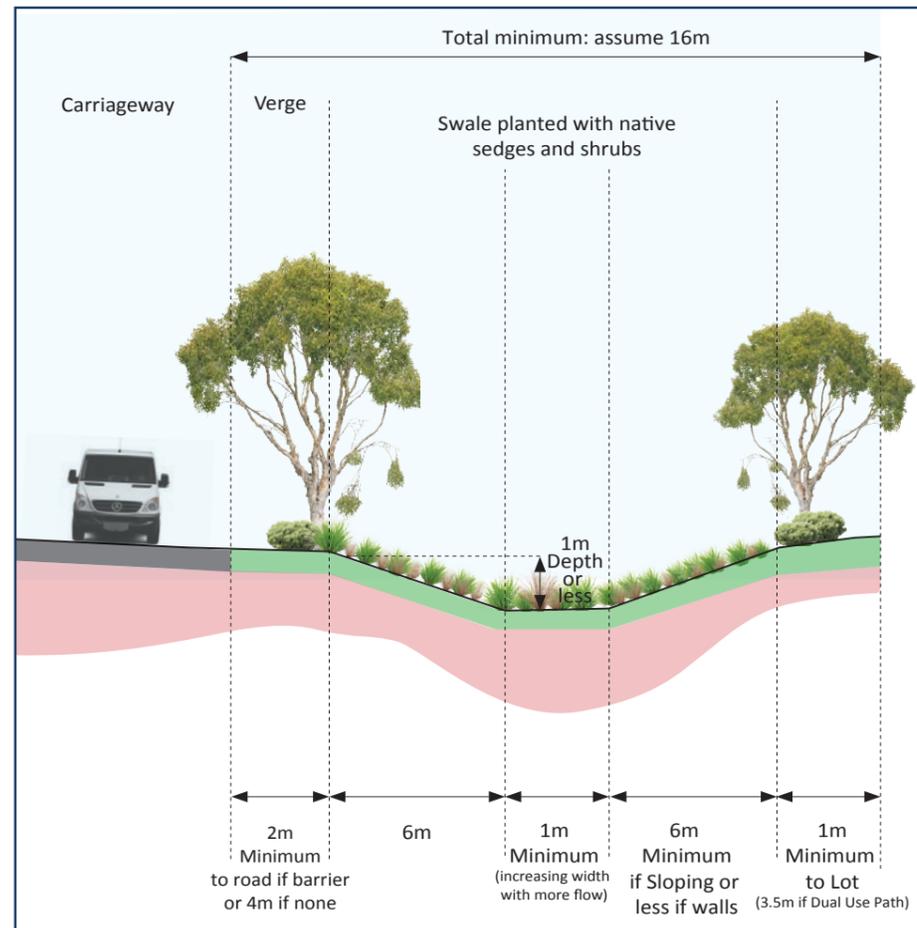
Road and Swale Cross-section Typical Arrangement for Minor Residential Street Swale
